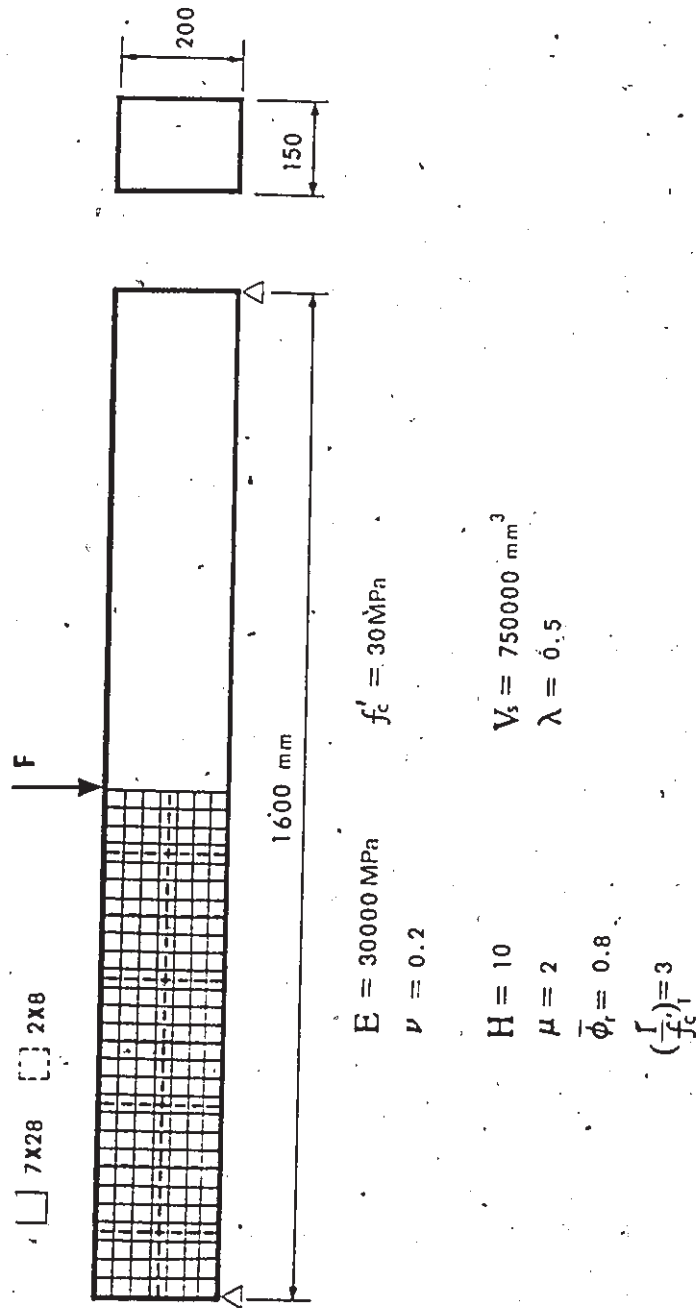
Geometry, Grid Layout and Material Properties of a Simply Supported Plain Concrete Beam.
